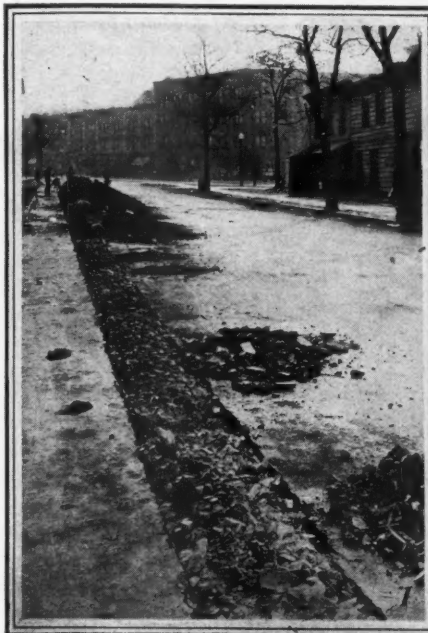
Asphalt and underlying duct loosened by CC-25. (No. 13336). Fig. 2—Tie Tamper breaking up concrete for track repairs in New York City. Fig. 3—Drift bolt in repair work on Los Angeles Street Railway.
